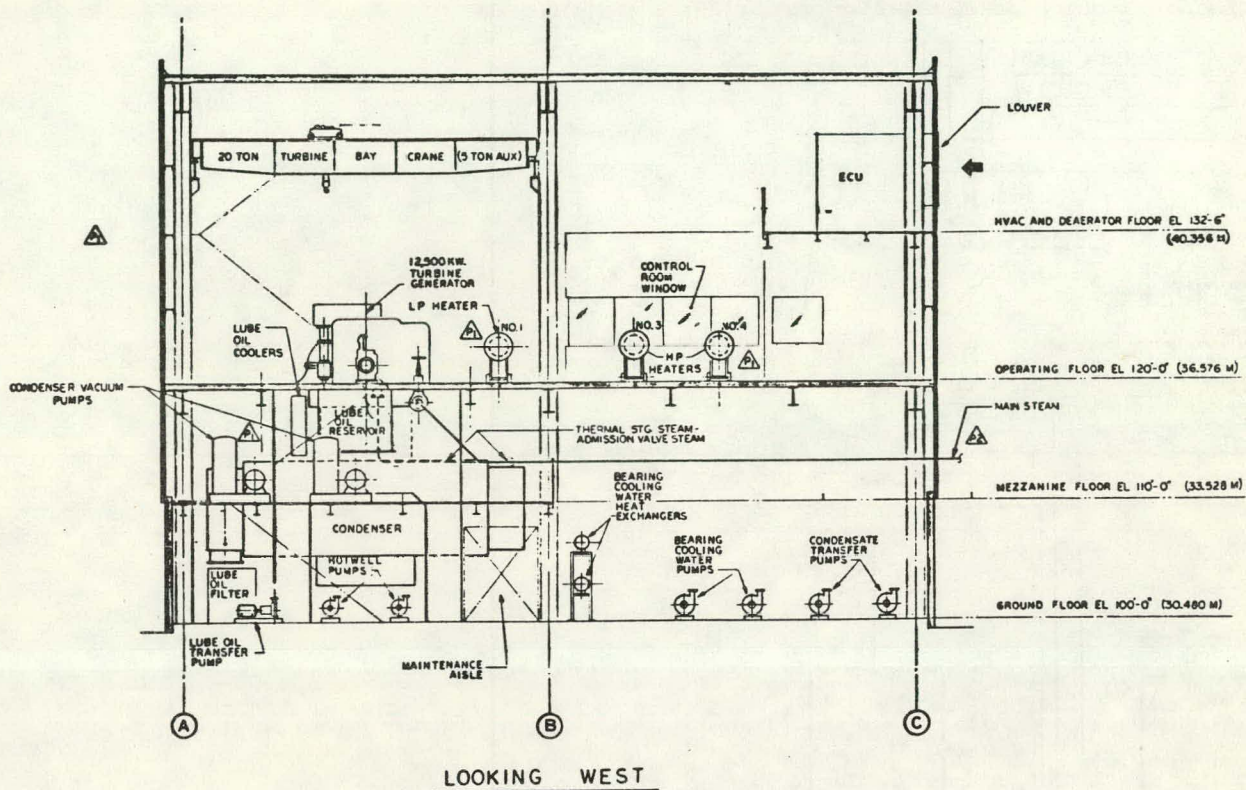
Pilot Plant General Arrangement -- Section of EPGS
